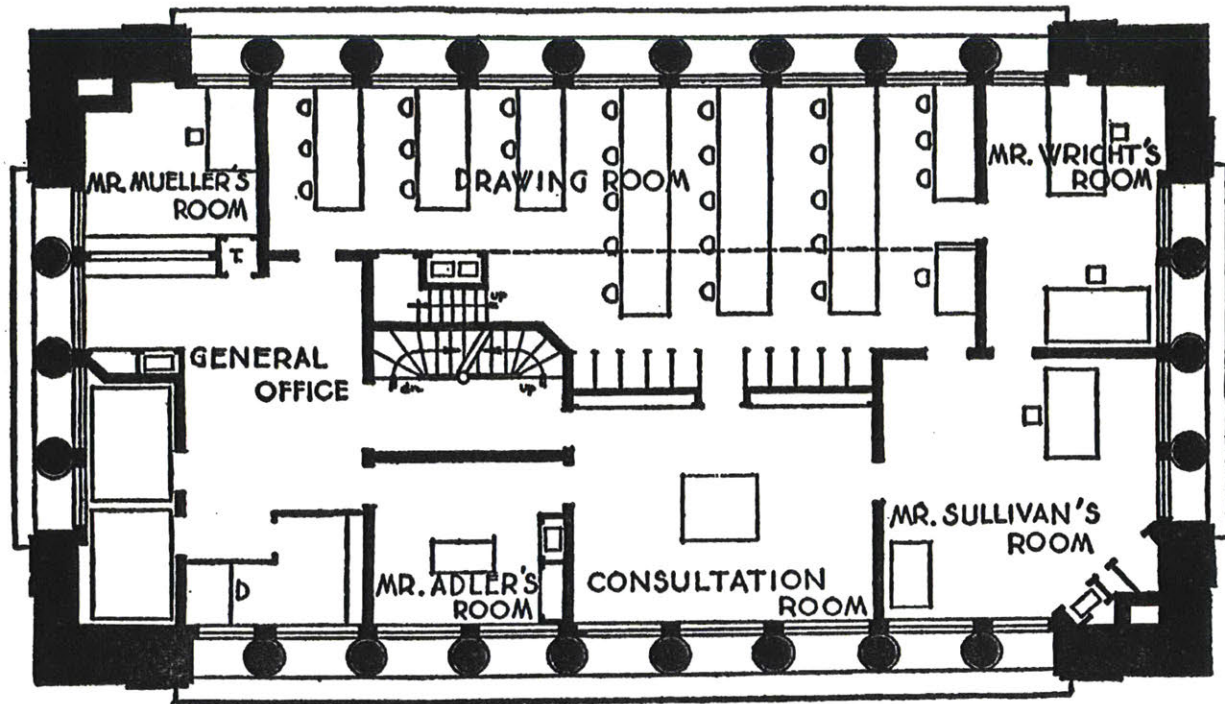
Plan of Adler & Sullivan offices, Auditorium Building, Chicago, drawn by Frank Lloyd Wright, *Genius and the Mobocracy* (1949)
